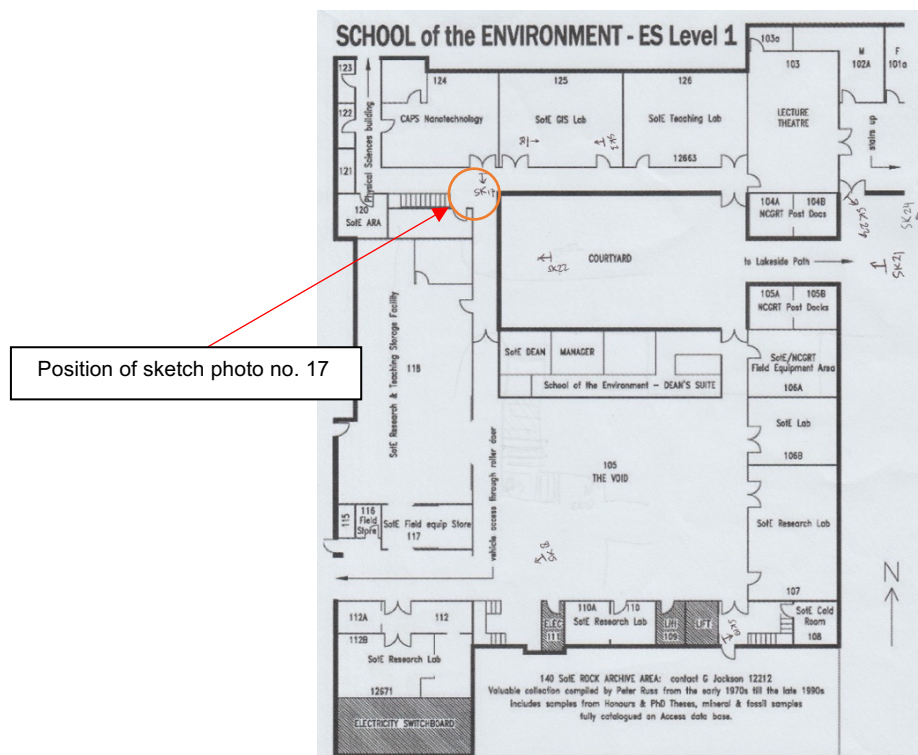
partially annotated floor plan of FU-ESB Level 1
